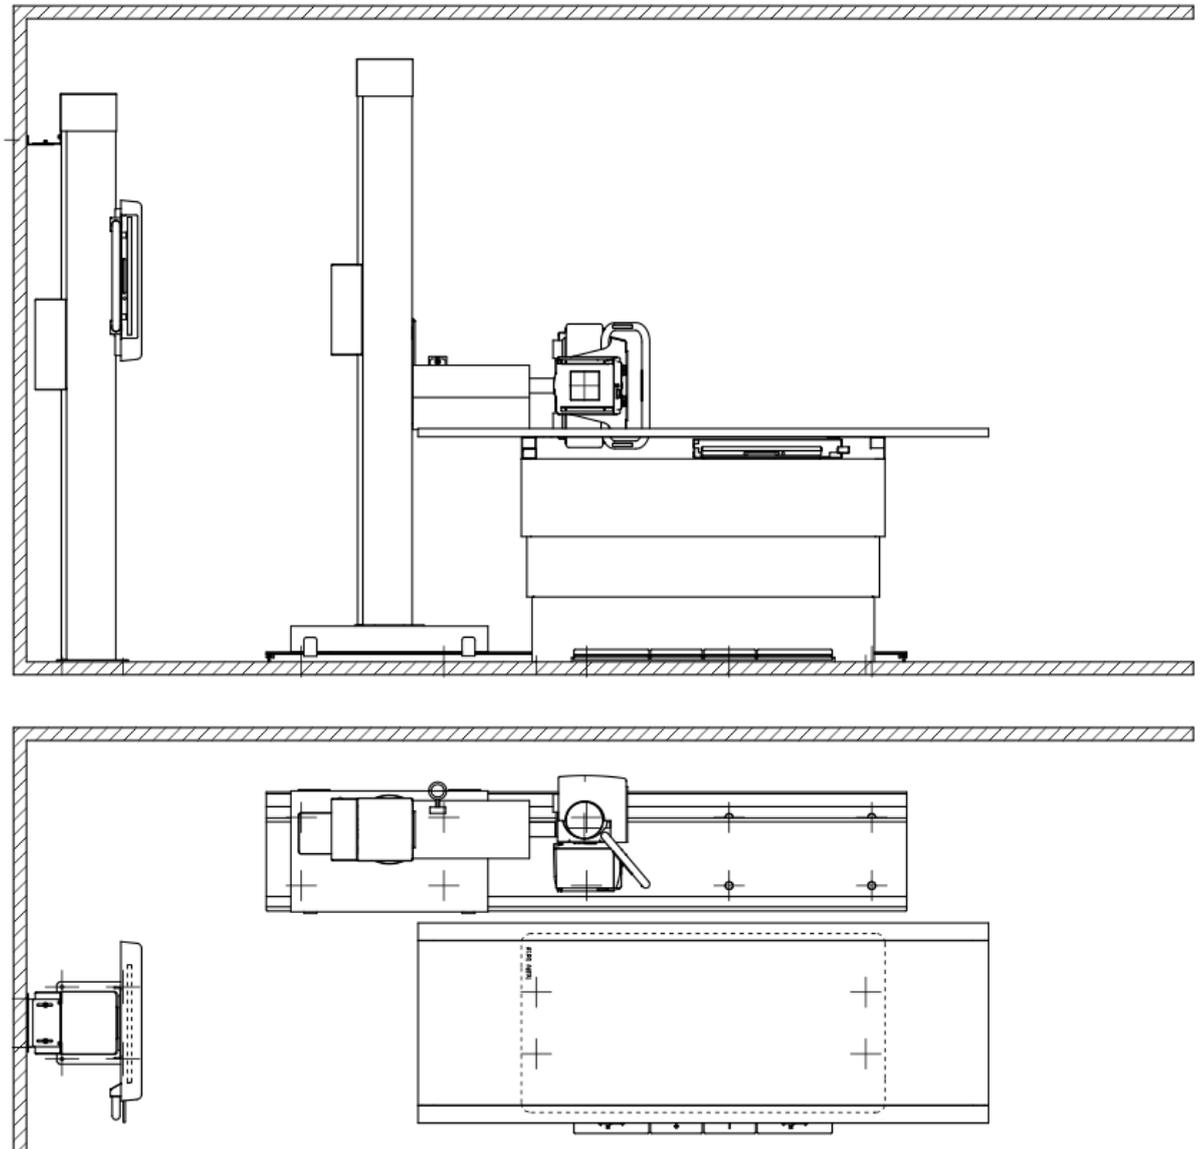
Perform-X F400 System typical room layout (lateral projection)
